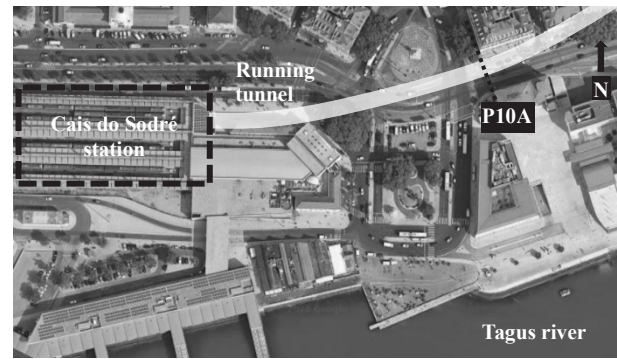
Top view of Section 63 of Lisbon metro with the identification of the location of the “Cais do Sodré” station, the running tunnel and cross-section P10A.
